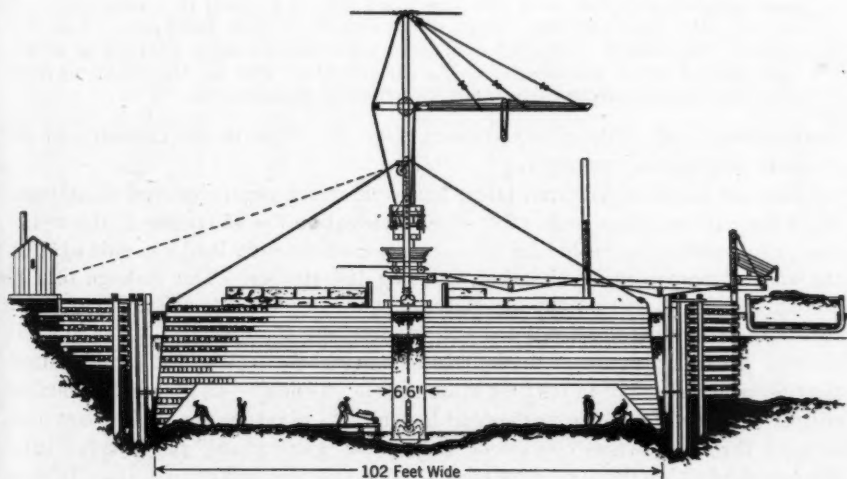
ARRANGEMENT OF EXCAVATING MACHINERY, BROOKLYN TOWER CAISSON
